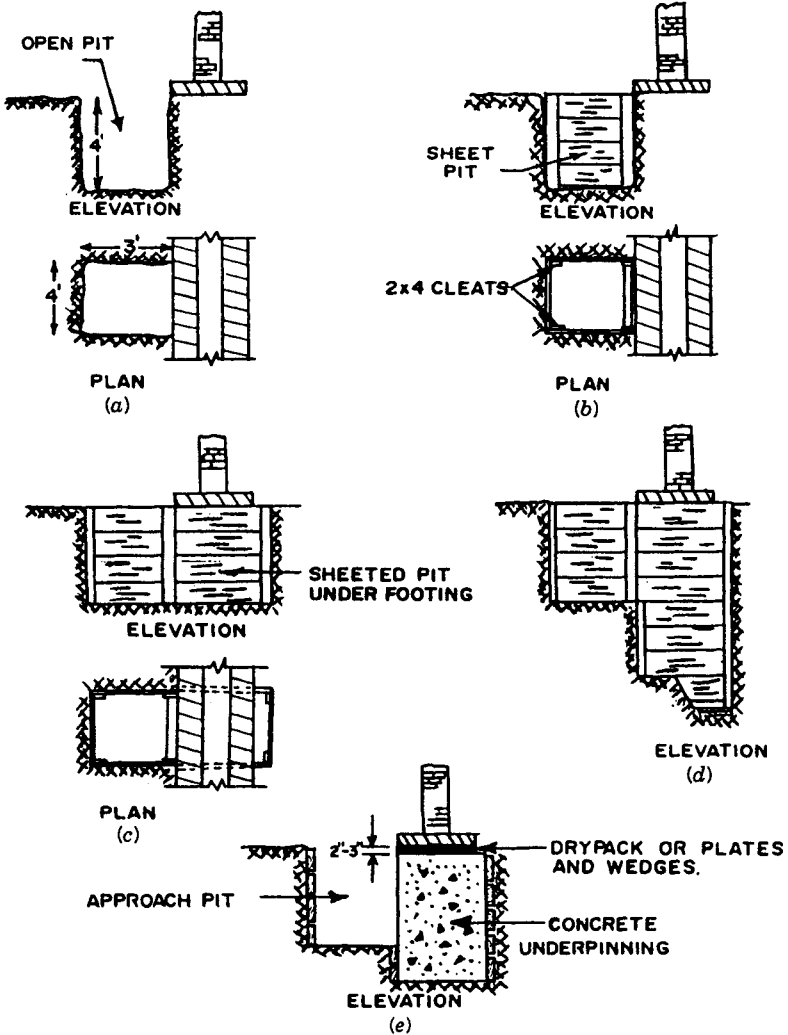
Pit or pier underpinning; typical installation sequence.
